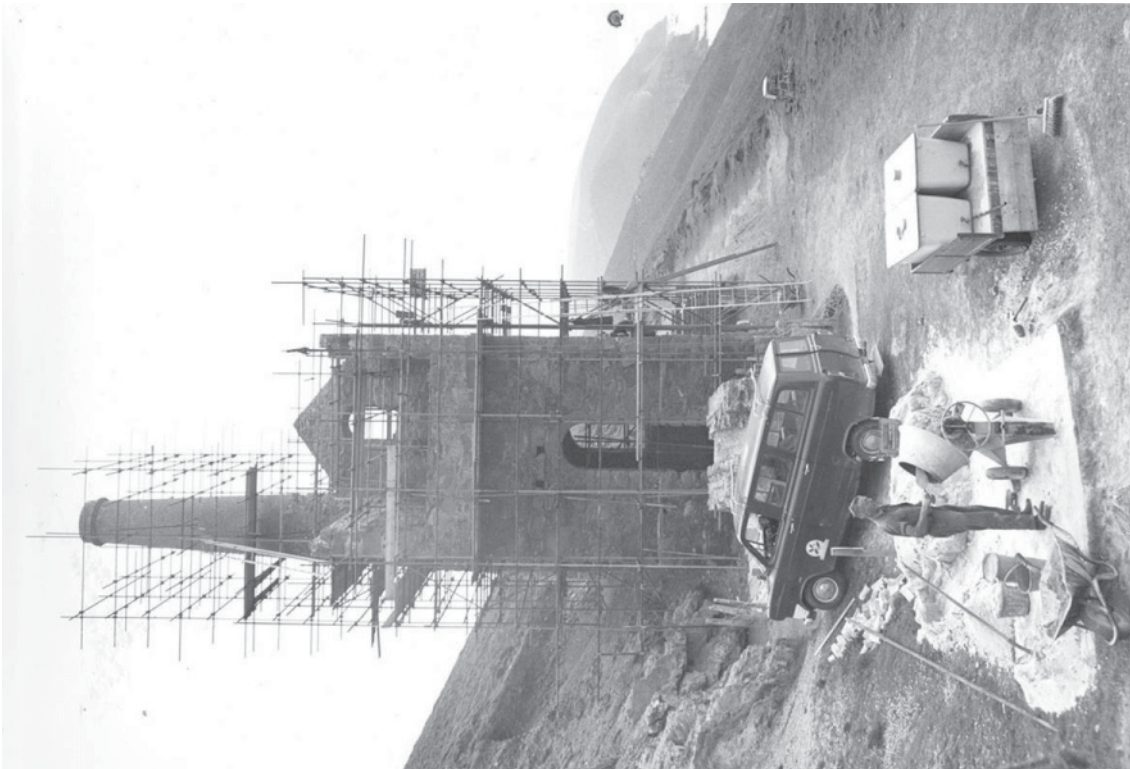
Reconstruction of the Tonanroath pumping engine house under way in 1973. NT Photo Collection.
